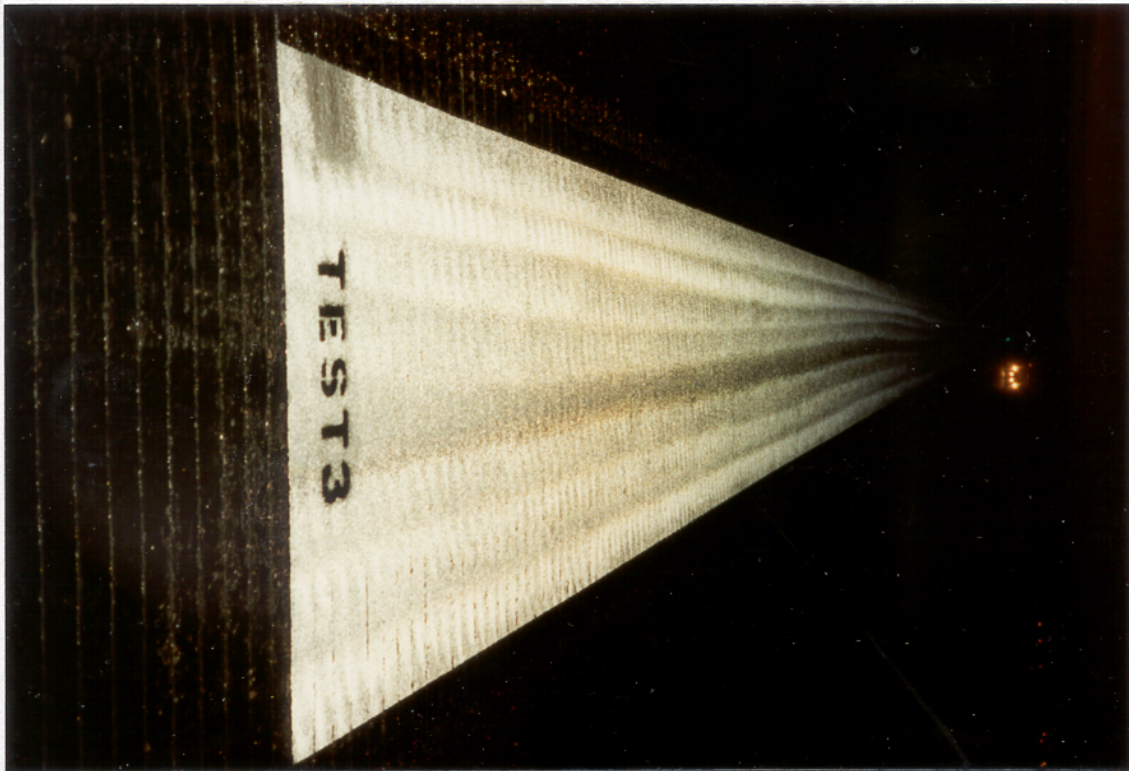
PAINTED RUNWAY TEST STRIPE (BEADED)
